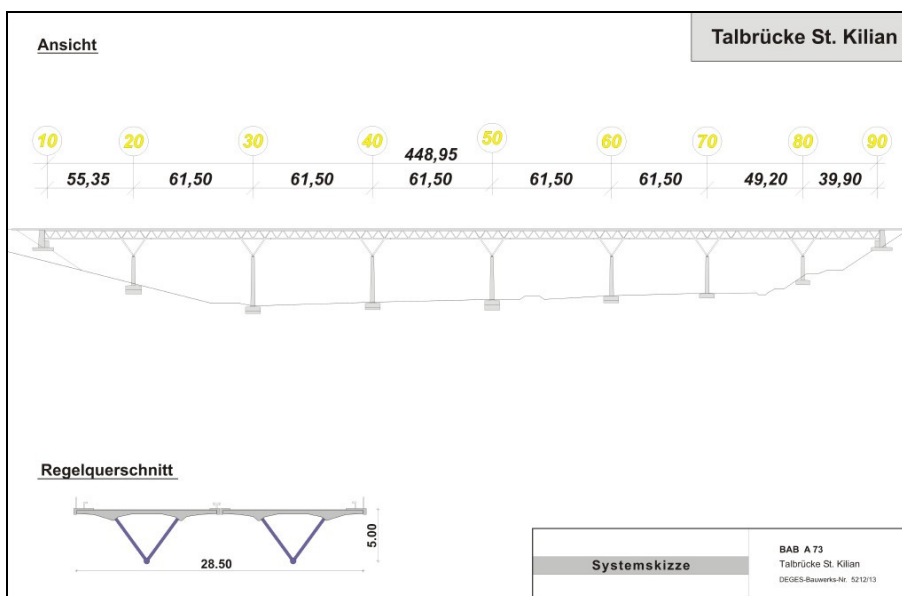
View of the composite bridge with a cross-section made of two separate triangle girders.
